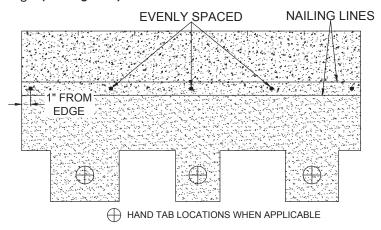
5-Nail Fastening Pattern and Hand-Tab Locations
